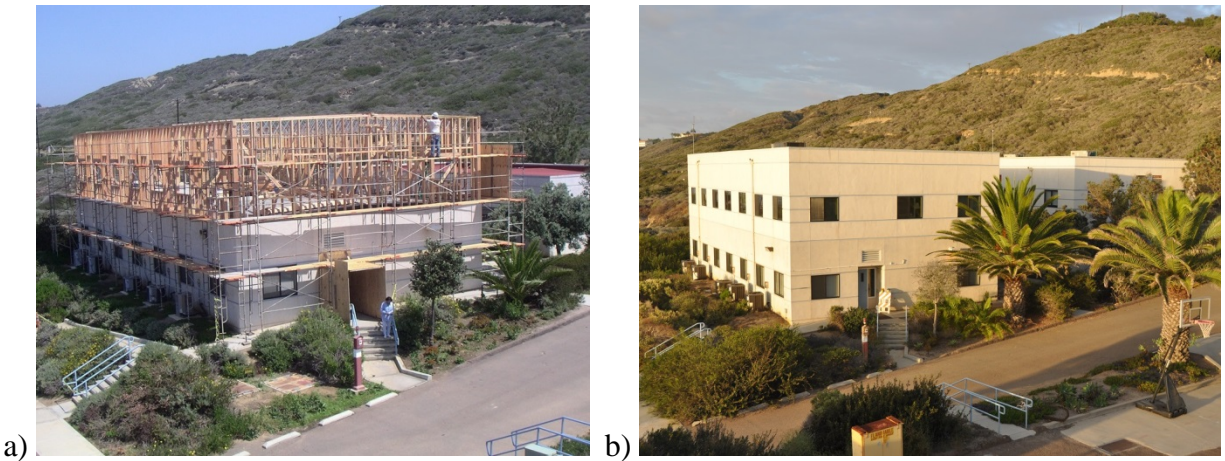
The second-story addition to Building 622 is shown midway through the framing phase, circa April 2004, with the single-story Building 624 at background right. b) Buildings 622 and 624 in 2015. The WWII-era switchback roads on the hill at upper right were earlier used for dune-buggy testing.
